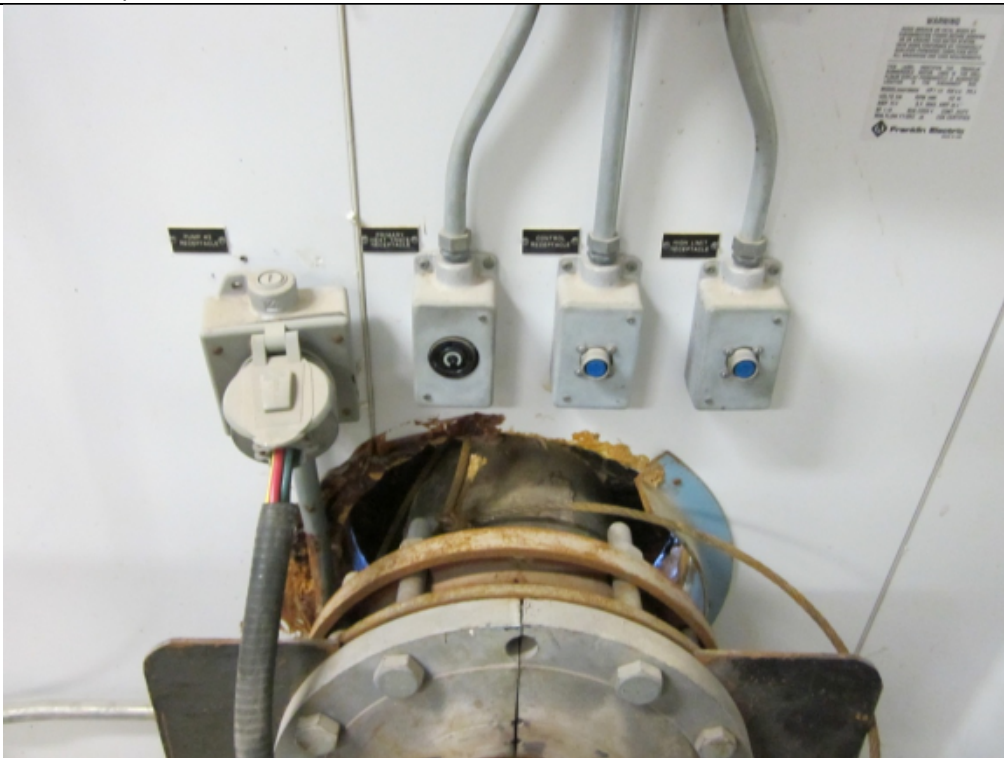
Pump P2 Receptacle and Separating Flexible Plug with Exposed Wiring on Left. No Heat Trace Connections for Pump P2.
